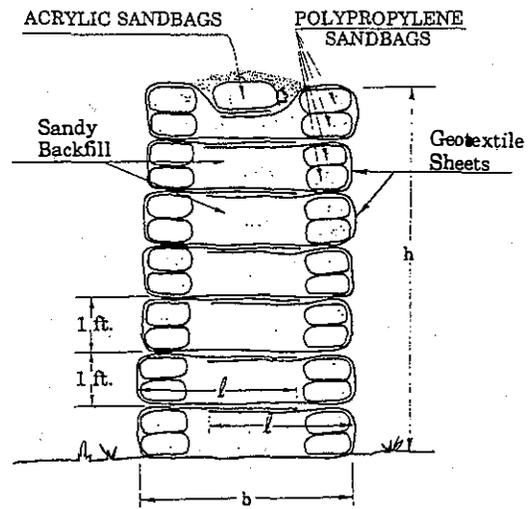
Geotextile-wrapped sandbag wall: cross section.
